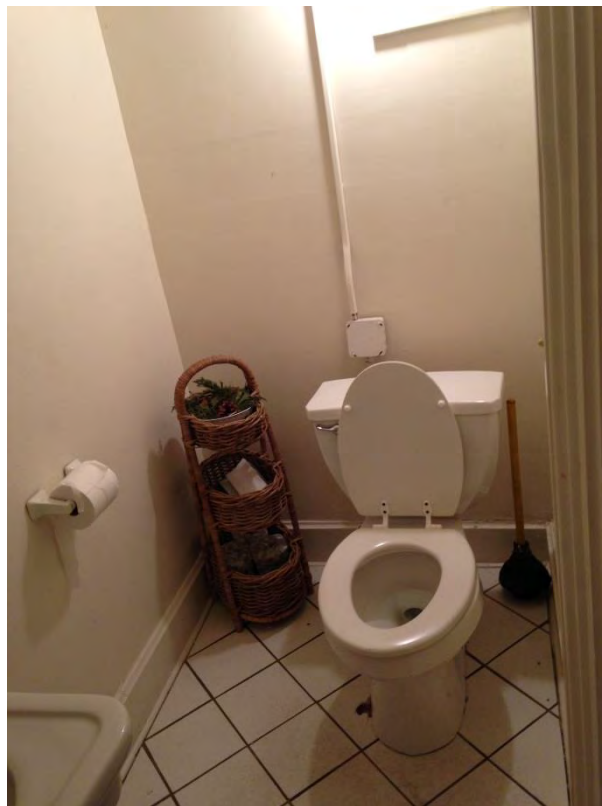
Broken toilet fixtures and cracked flooring in one of the facility's 3 bathrooms. Note the absence of handicapped access fixtures.
